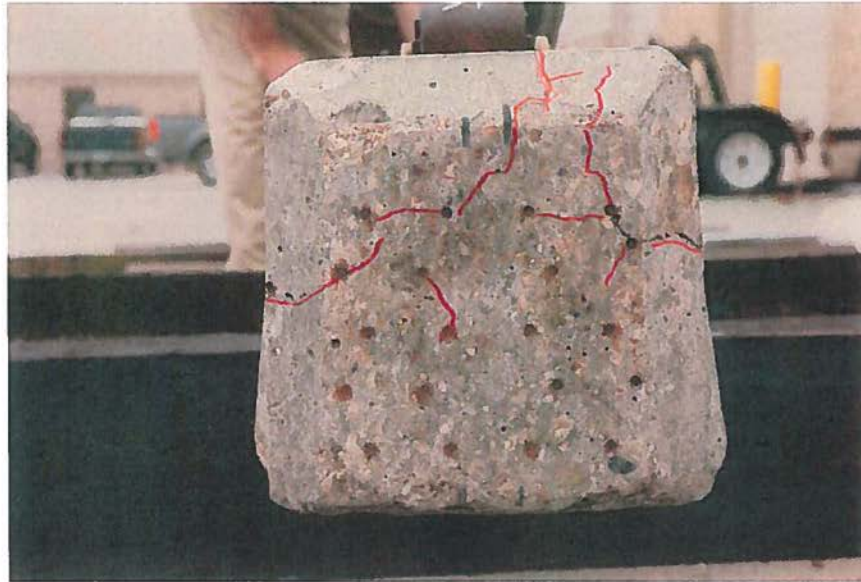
Close side view at north end of tie NDT #7, visible crack not outlined. L3672 102312 08
